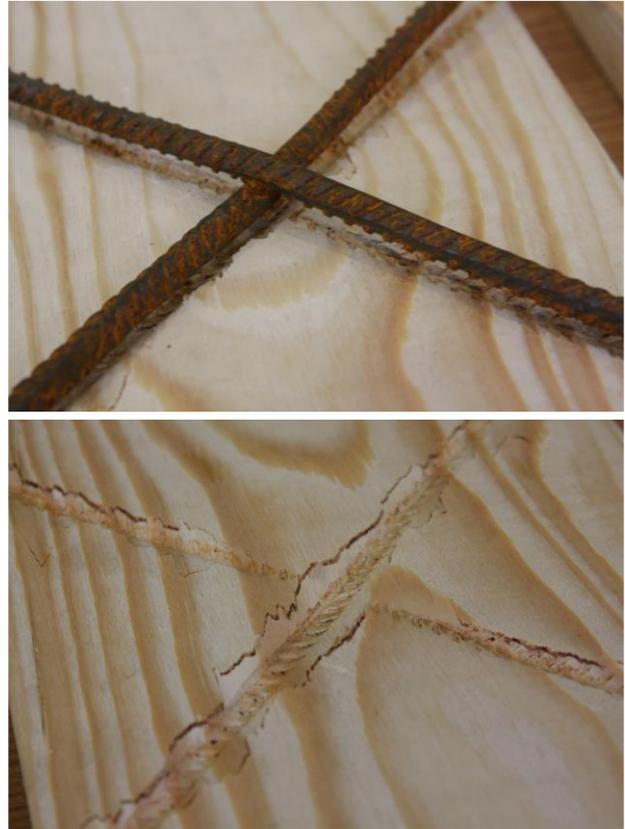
A timber-concrete system rib with a pressed-in reinforcement mesh
